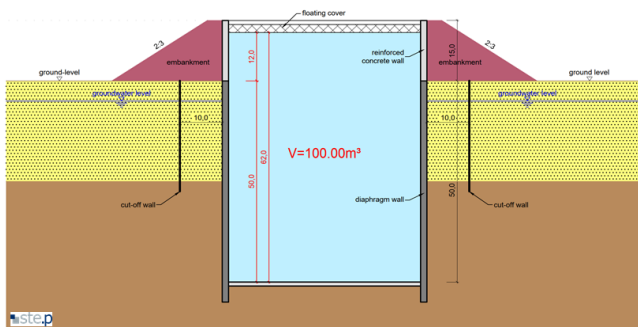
Sketch of the structure of a buried tank TES with diaphragm walls and embankment (Tosatto, Ochs, Dahash and Muser, 2022).
